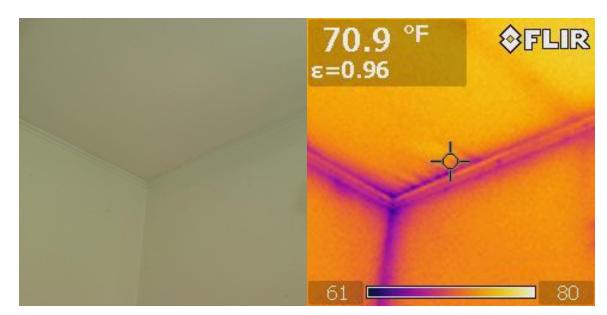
Infiltration Detection—Wall and Ceiling Seams
